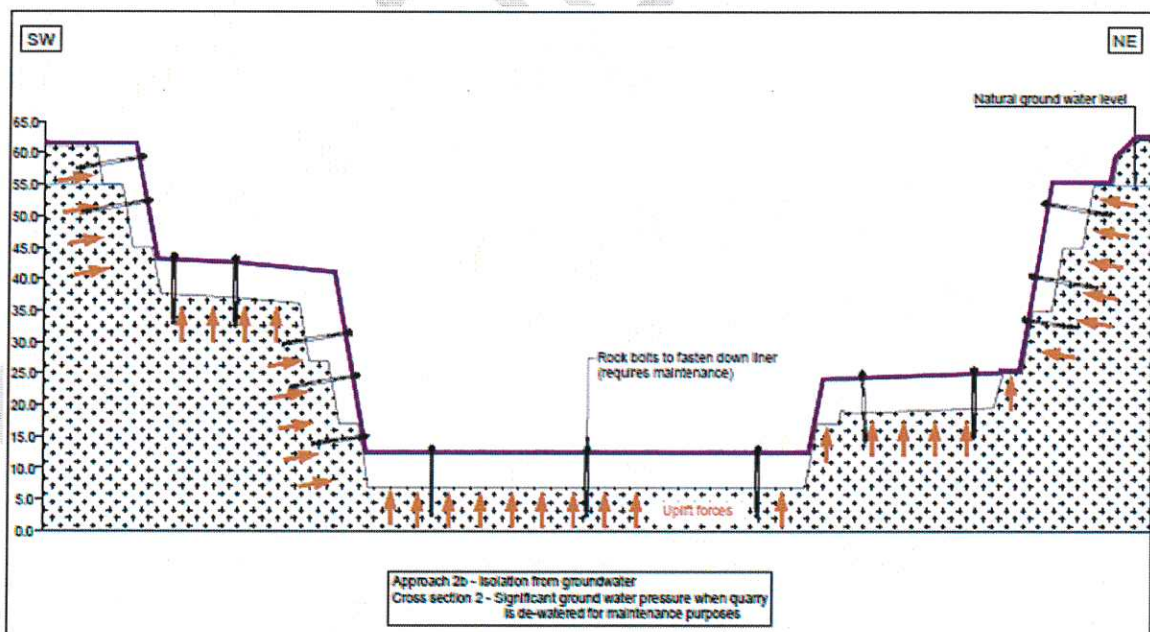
Cross section illustrating the requirement of the liner to resist uplift forces for Approach 2b
